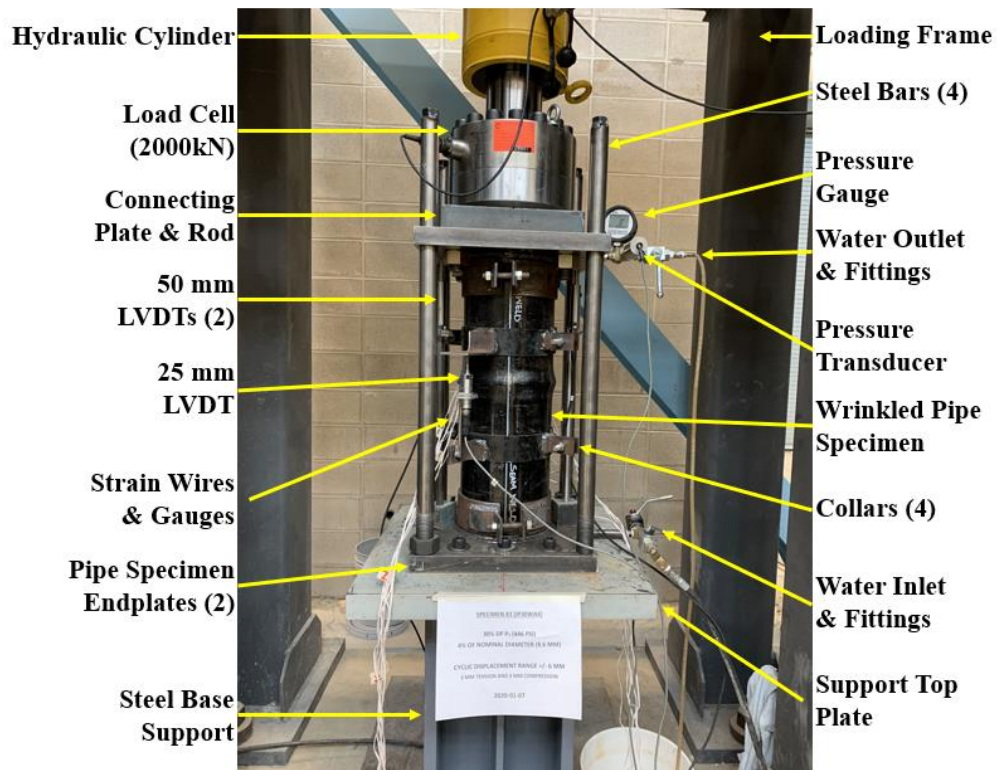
Test Setup for Axial Cyclic Loading Stage
